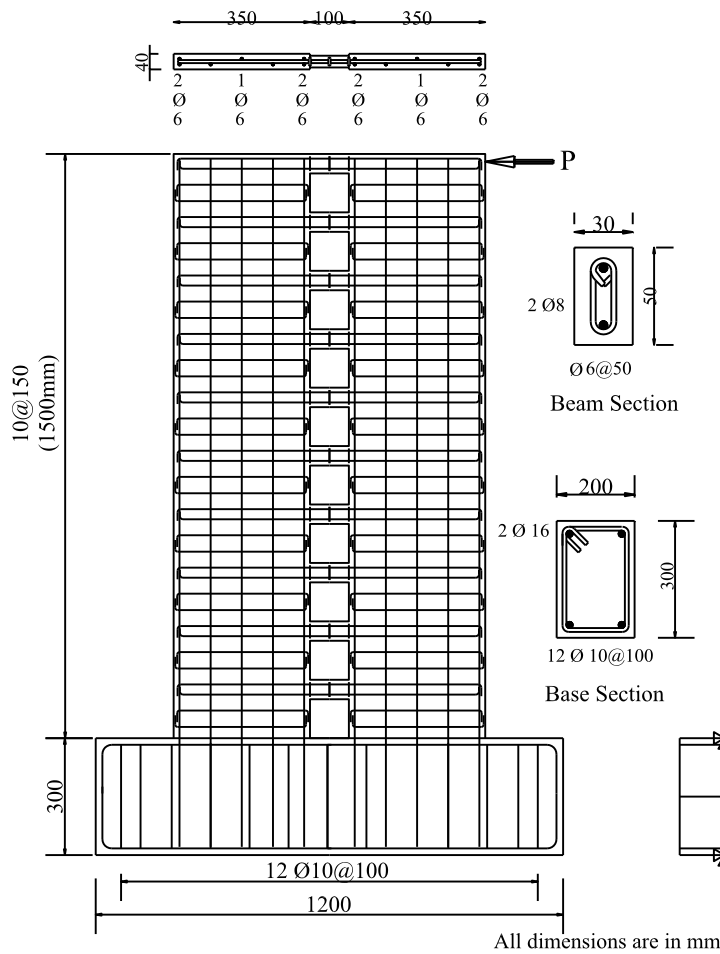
Geometry and reinforcement details of coupled structural wall Model 1 tested by Marsono (2000)
